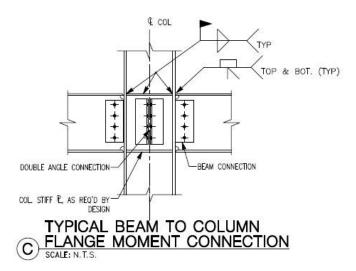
Typical Moment Connection Drawings Courtesy of JCJ Architecture
